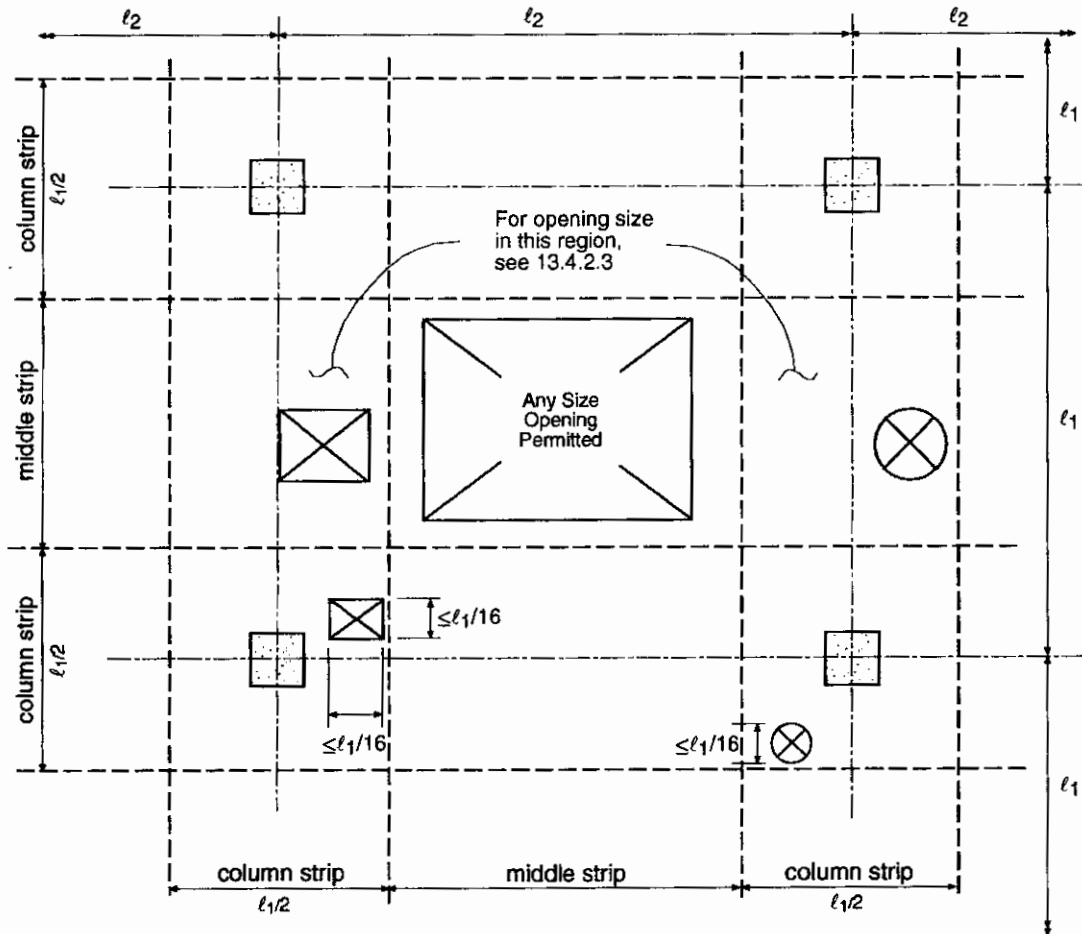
Permitted Openings in Slab Systems without Beams for $l_2 > l_1$
